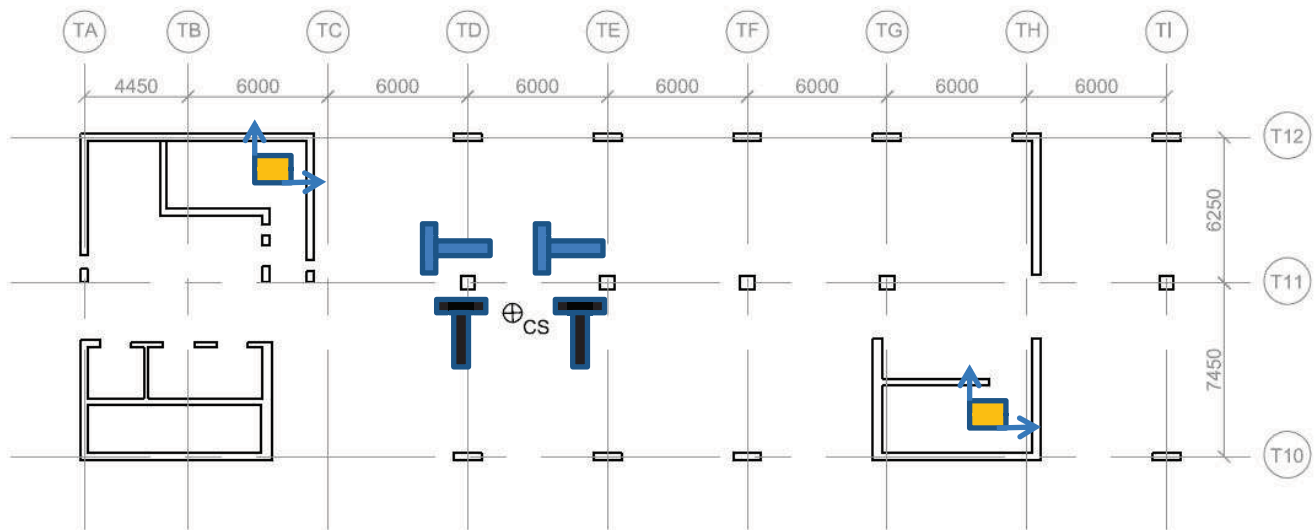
The two twin towers shown in [Figure 1](#) are nearly identical with regards to the structural system. The main structural system consists of concrete cores in both ends of the towers with a monolithic concrete floor spanning in between erected on columns. Positions of the OMA sensors in the two stair case structures are indicated together with positions of the shakers for mode 1 (blue) and 2 (black).
